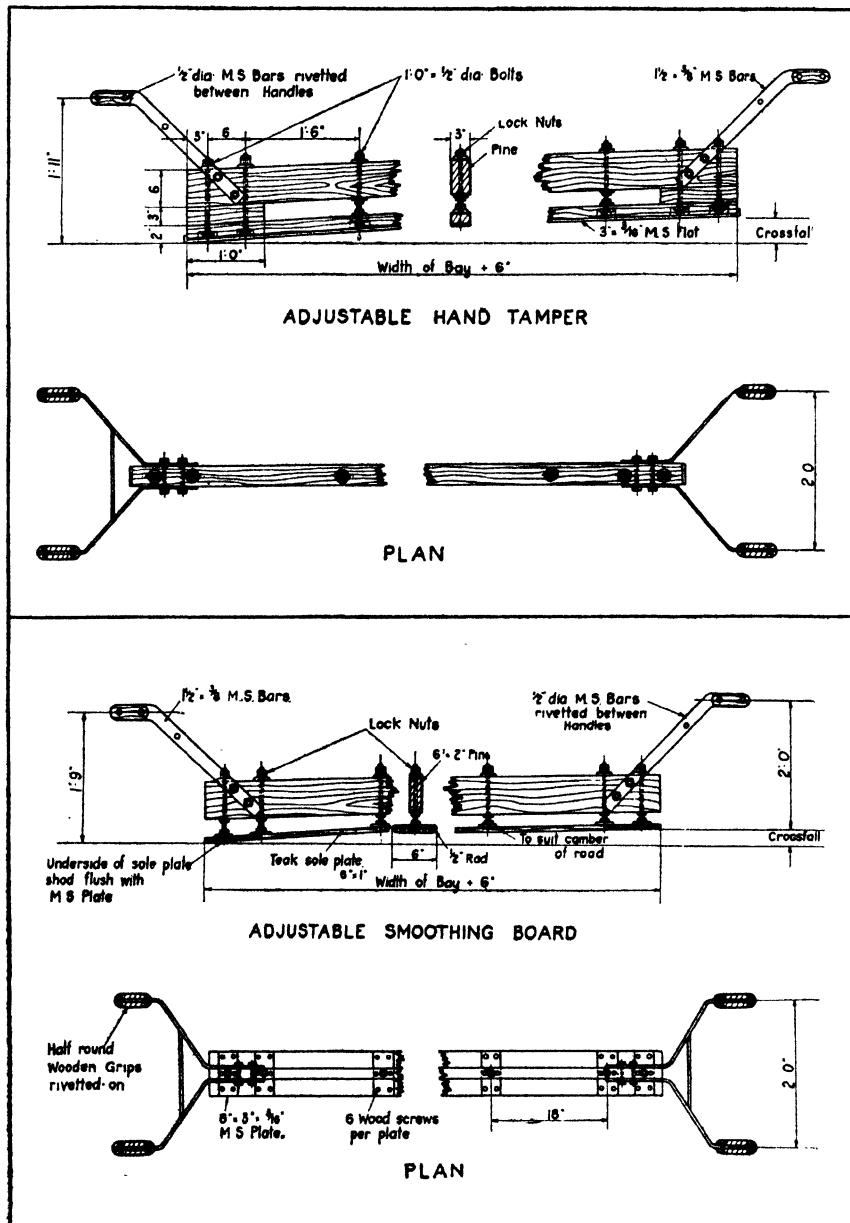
ADJUSTABLE HAND TAMPER AND ADJUSTABLE SMOOTHING BOARD
